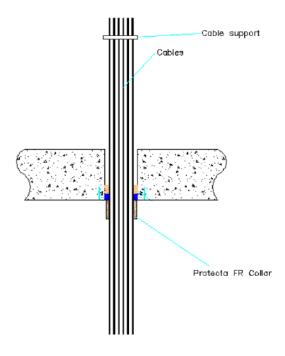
General arrangement of cables penetrating a 150mm thick concrete slab and protected with Protecta FR Collar
